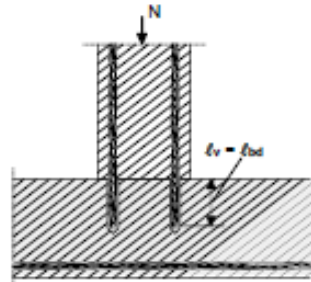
rebar connection for components stressed primarily in compression; rebar is stressed in compression
